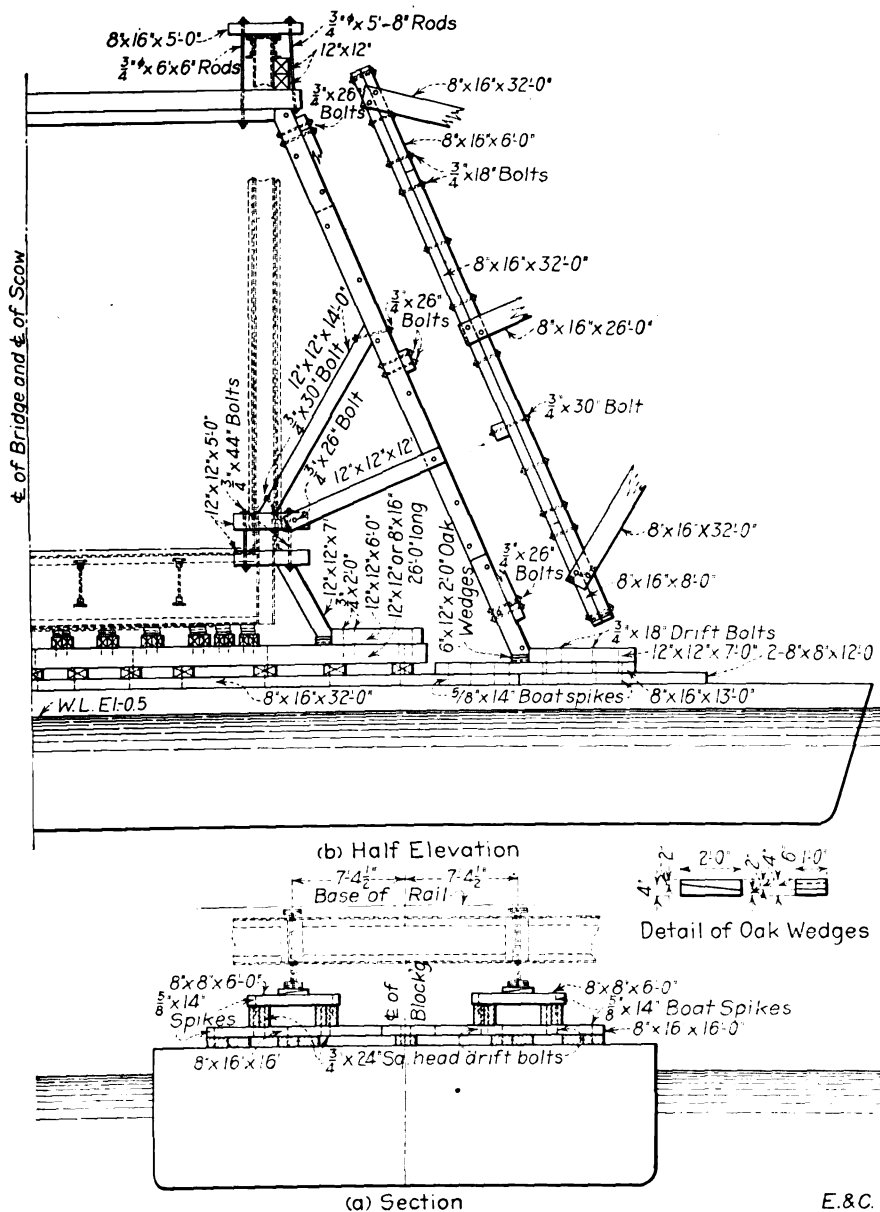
Elevation and Cross Section, Showing Blocking Used to Support New Swing Span on Scows, and Struts Used to Distribute Loading Over Scows—C. & N. W. Ry. Bridge.
